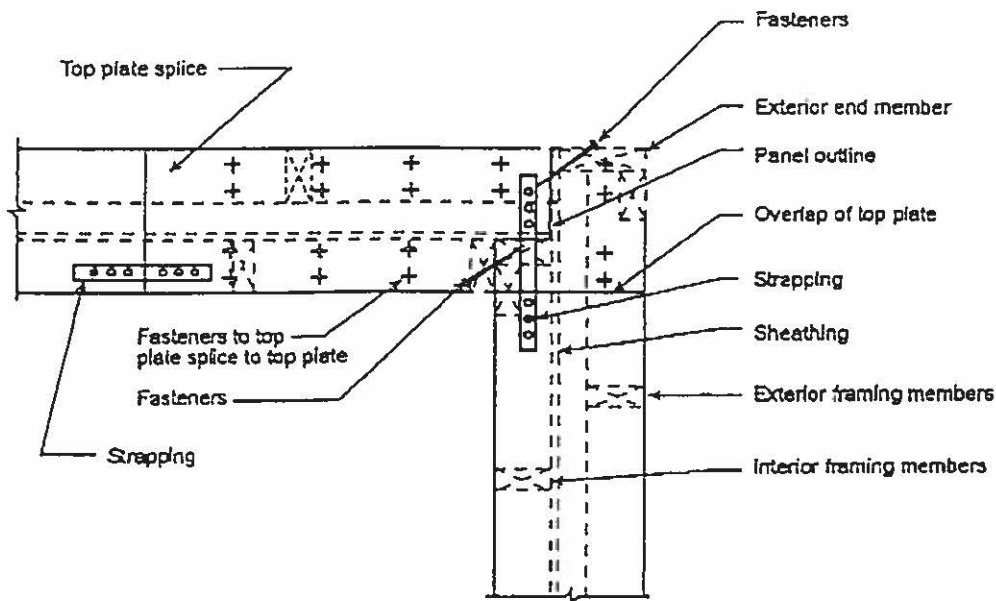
Typical fastening connection of the top plates and at corners for continuity and stability (top view)
